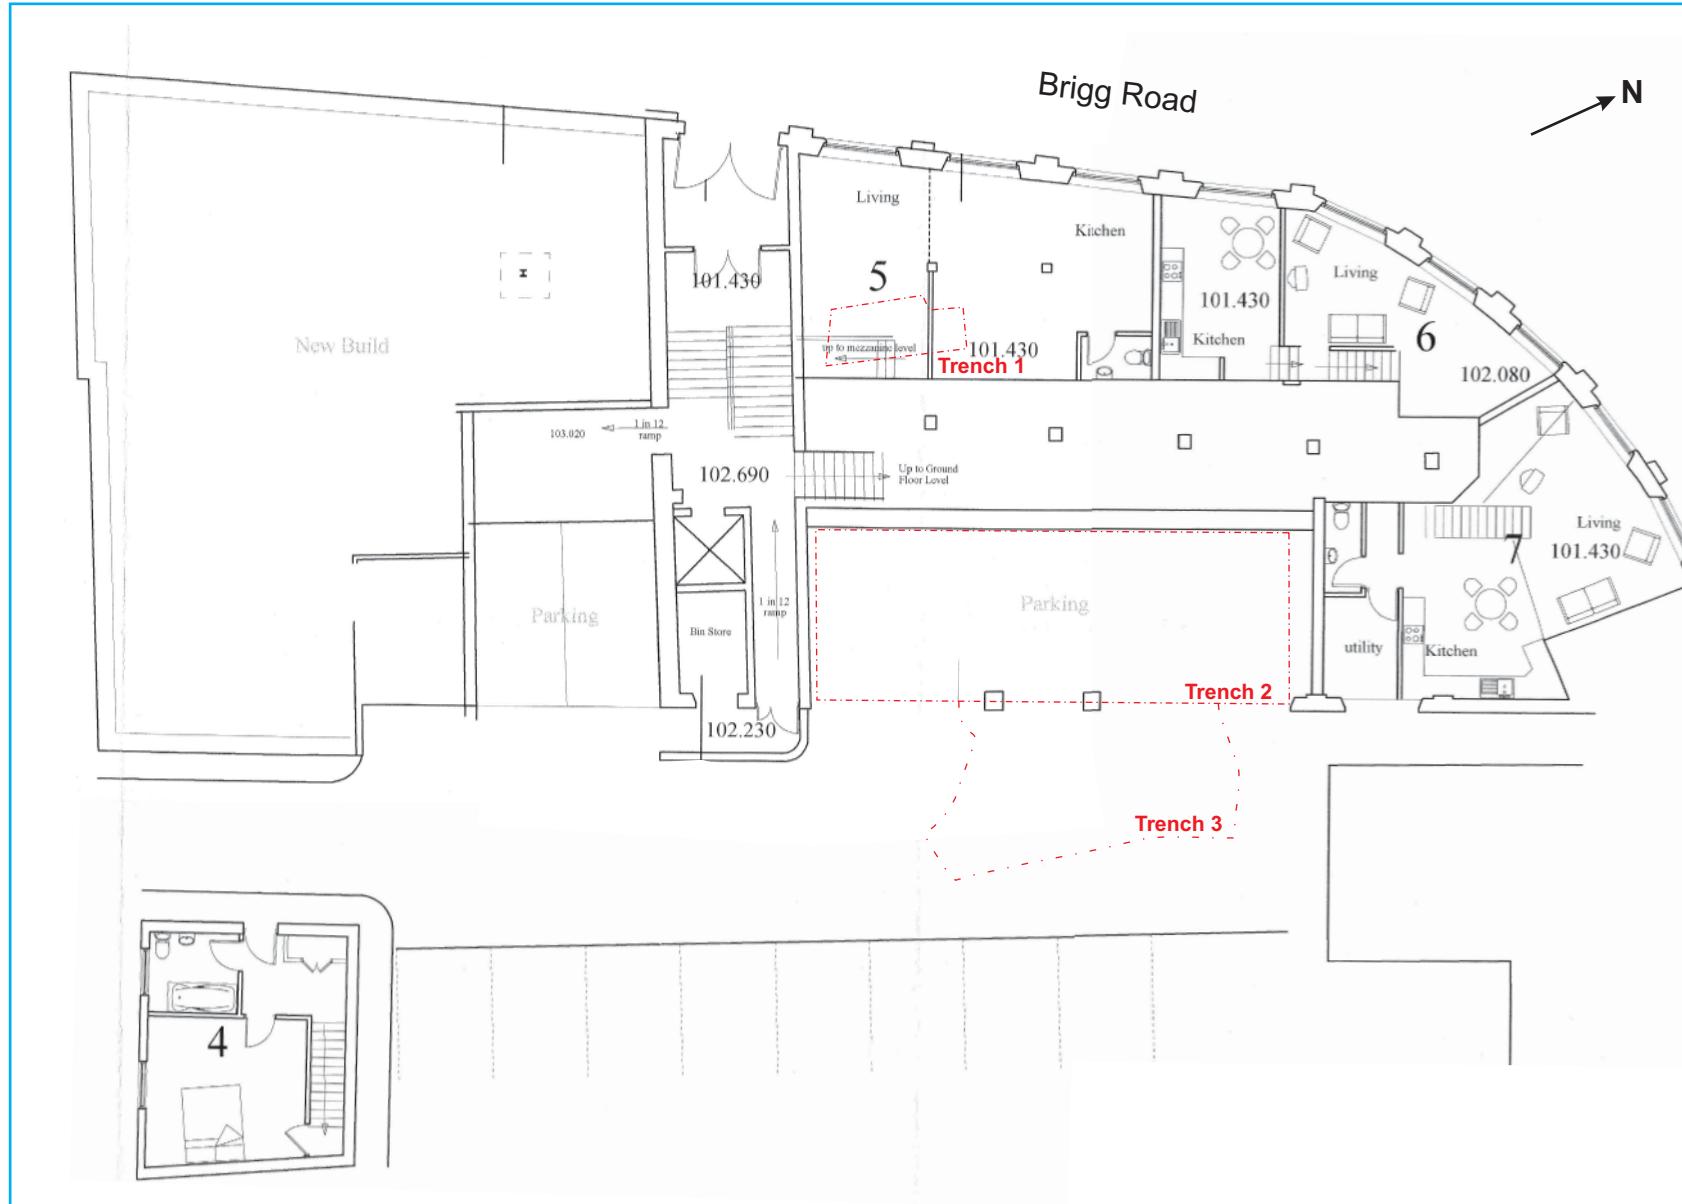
Plan of the lower ground floor of the development, showing the areas investigated in red (scale 1:200)
